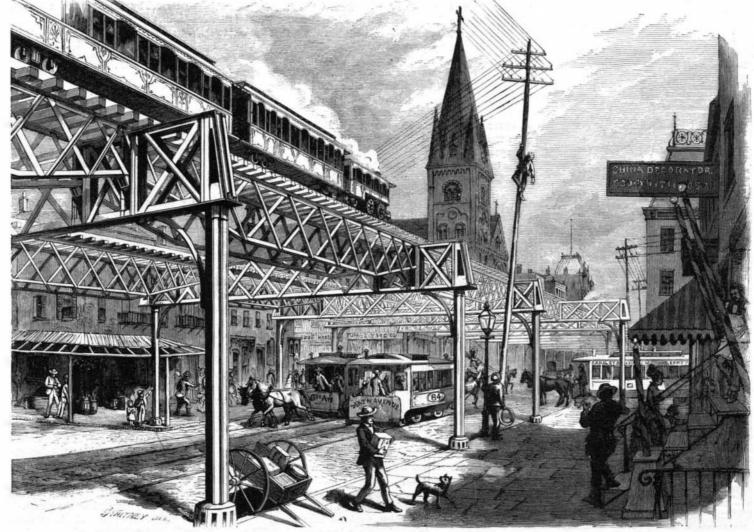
ELEVATED RAILROAD, WEST BROADWAY AND CANAL STREET.
